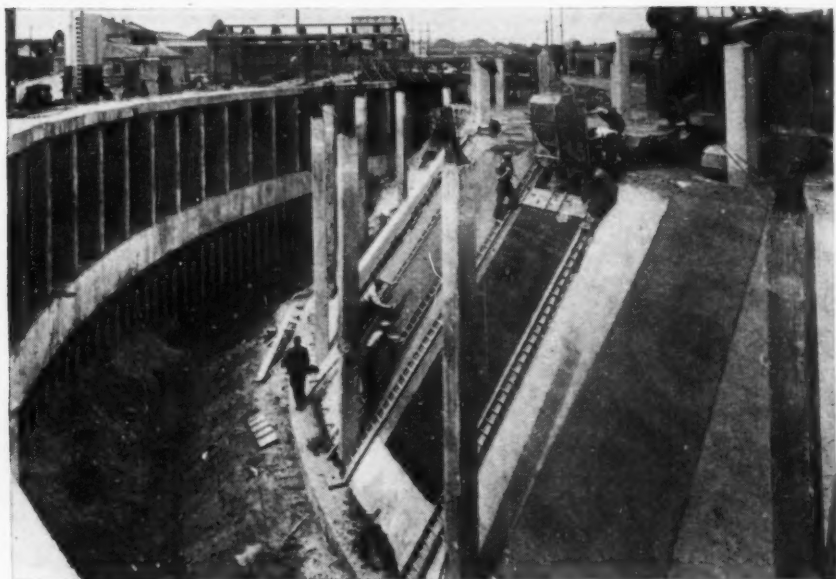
Placing Concrete on a Slope of 60 deg.
